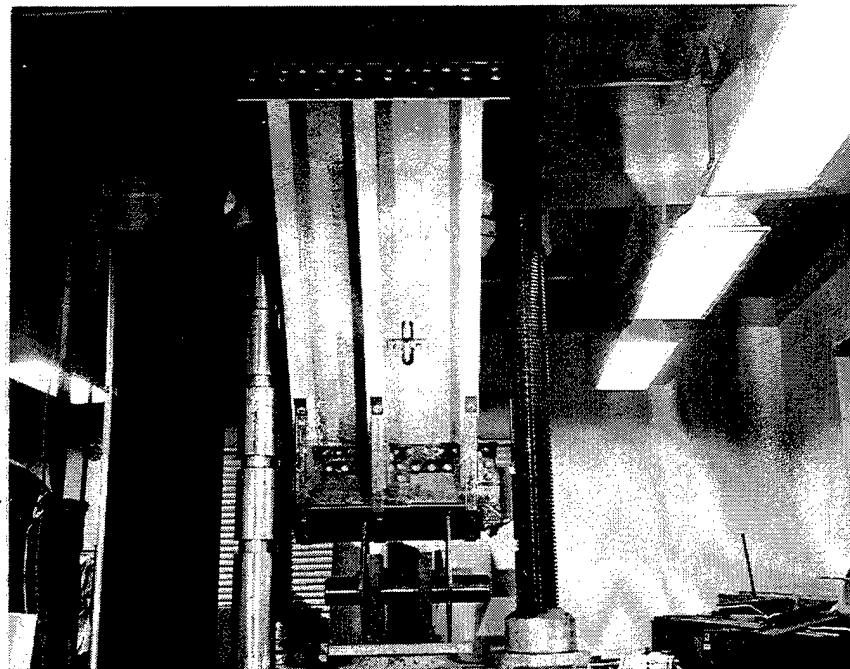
Back view of the test section in Figure 72. The section is positioned in such a manner that the lifting bar bolted at the oblong hole would be loaded at 45° to simulate the loading condition when the lifting sling with legs at 45° to the lifting points is used to lift the AVLB.
